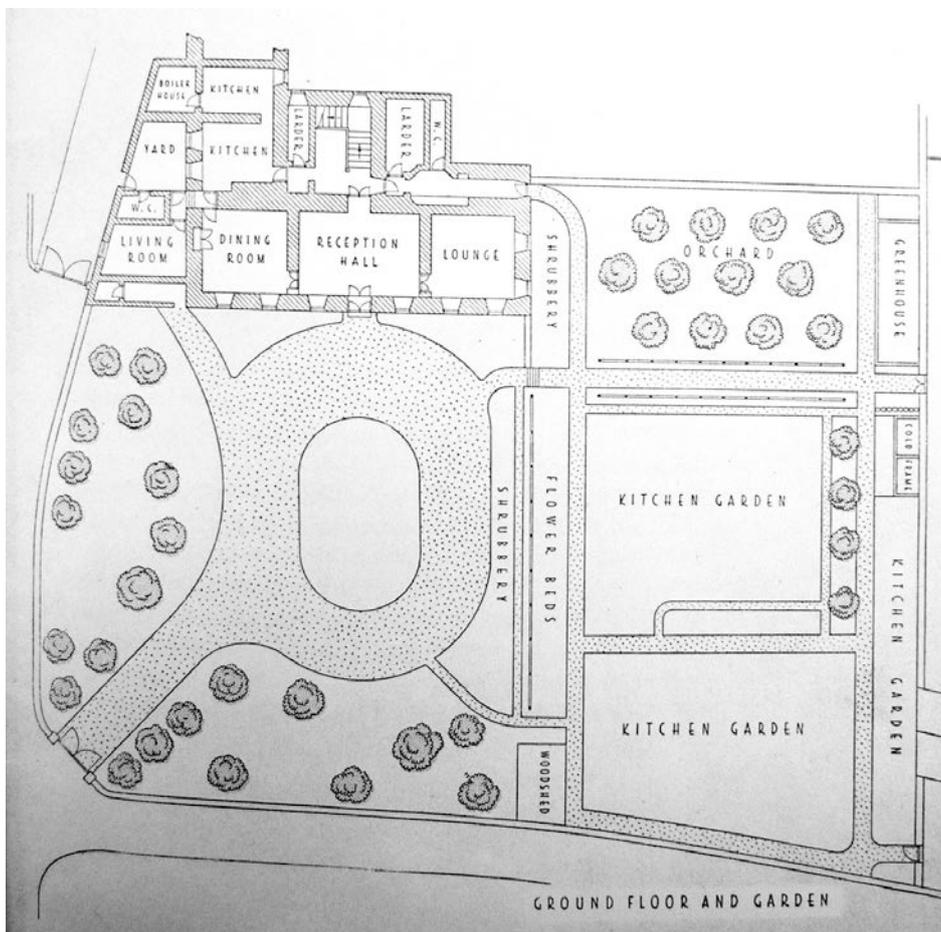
Ground floor and garden plan, c1949 (High Duty Alloys Ltd c1949)
